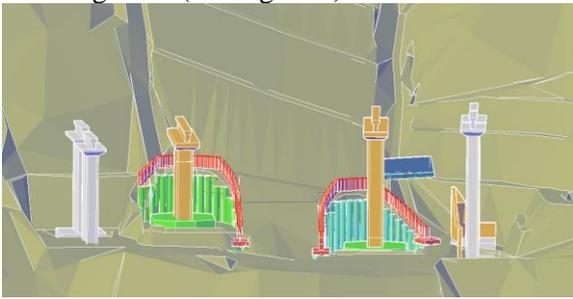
Protection walls R3\_1 and R3\_2 for new piers (3D View)
